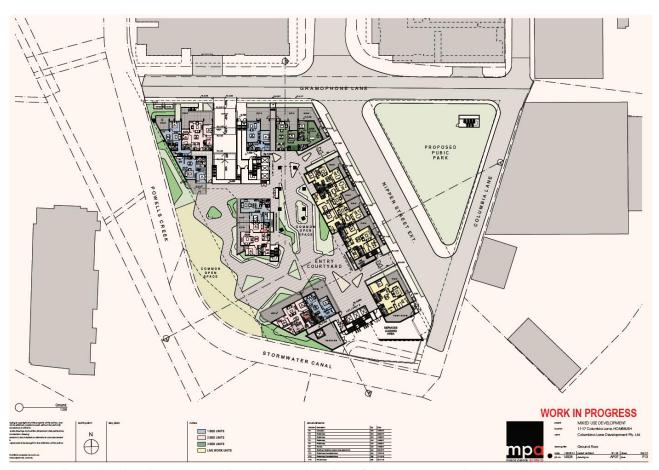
Plan showing the proposed footprint and location of the open space in the north-east corner of the site.
